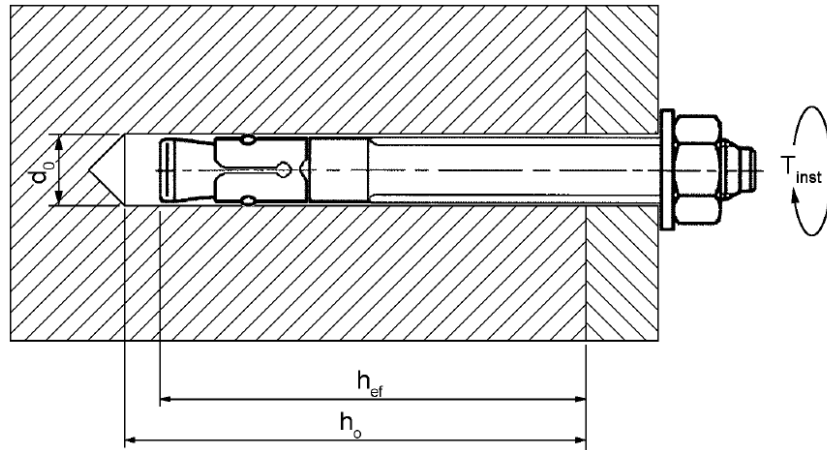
Installation parameters of TT-THROUGH BOLT steel expansion fasteners, versions TT, TT-G and TT-SS
